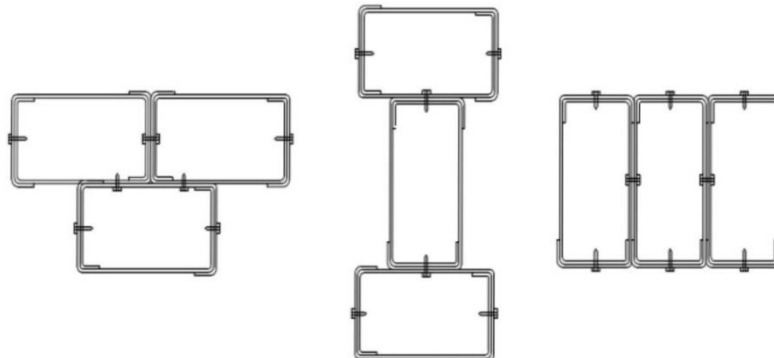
T shaped, I shaped and composite rectangular shaped multi limbed built-up box columns
